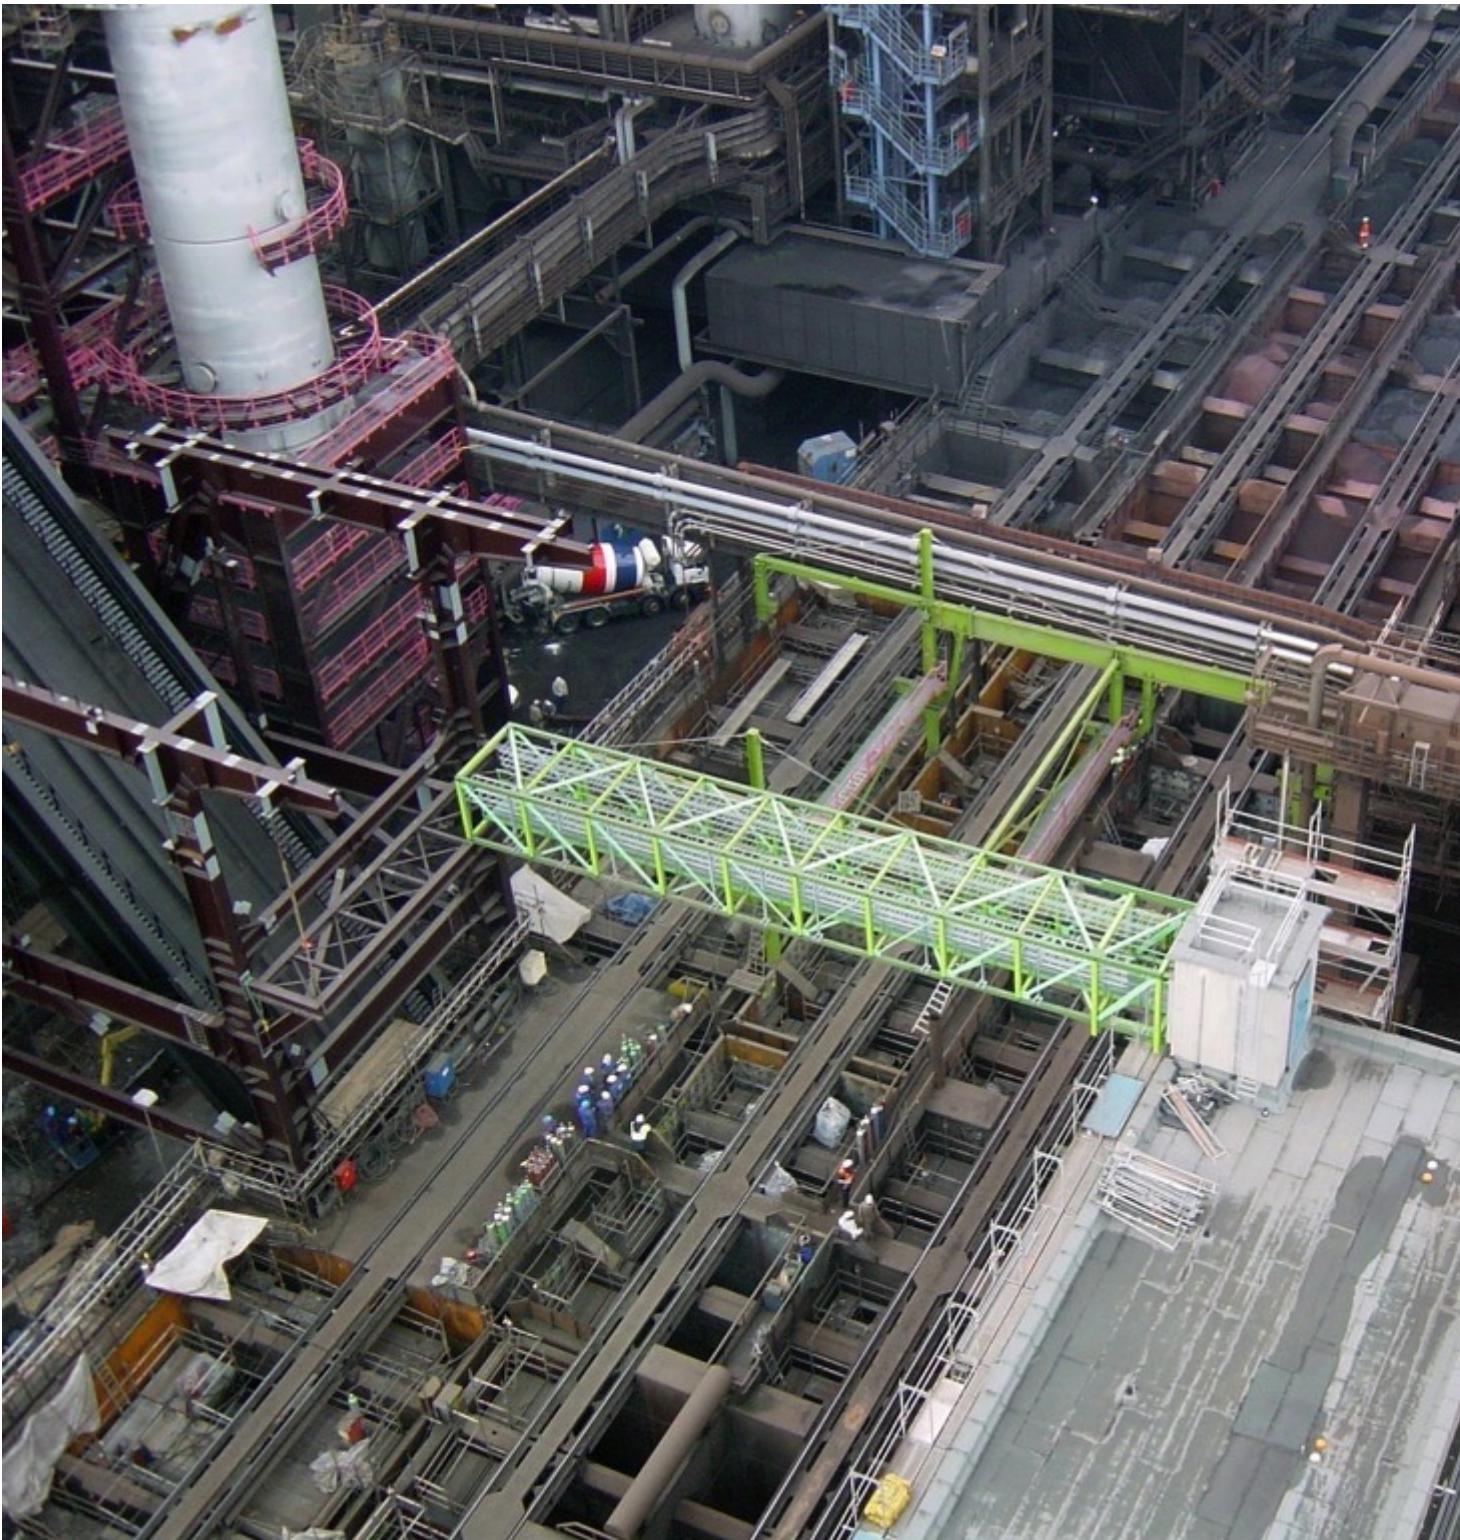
General view of the elevated railway bunker unit (without dust removal unit)
